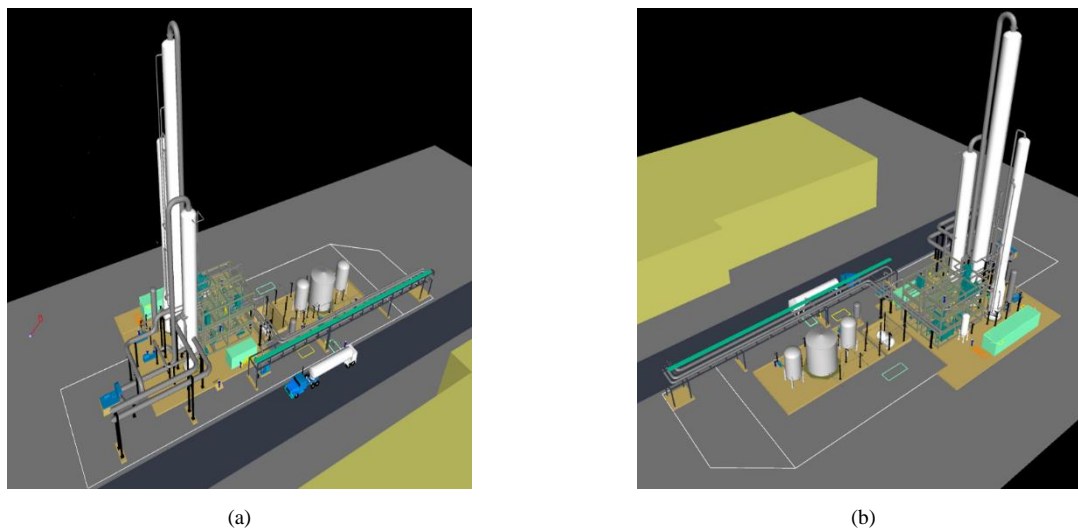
3D renderings of PCC facility: (a) looking down from power plant, (b) looking back towards power plant.
